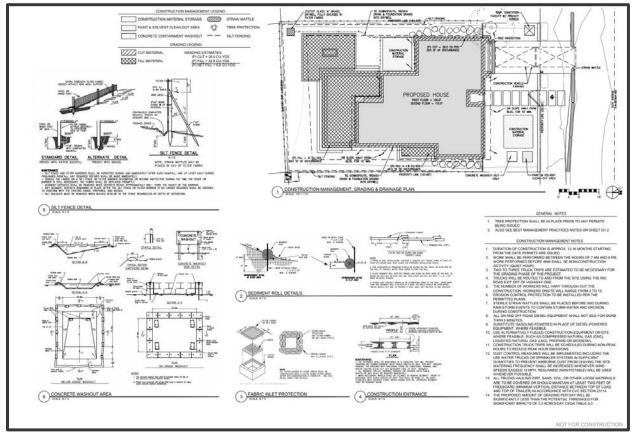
Construction BMPs and Proposed Storm Water Drainage Plan
